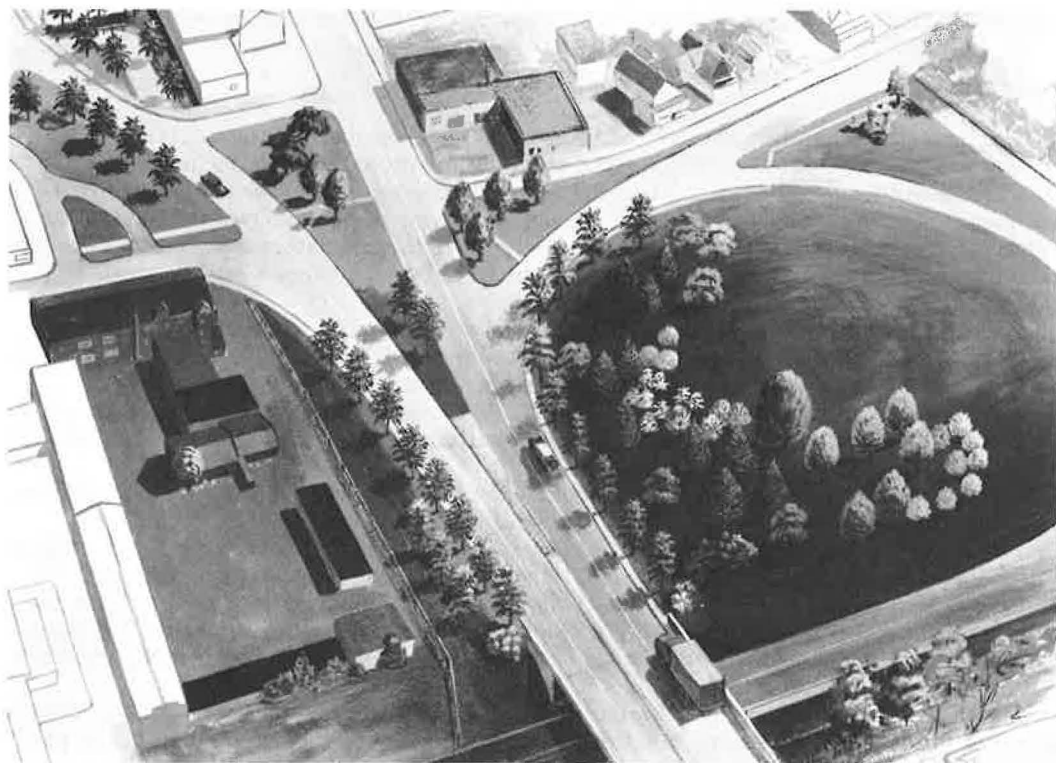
Sketch of Colliers Bridge looking north. Note landscape screen treatment of industrial area on left.
